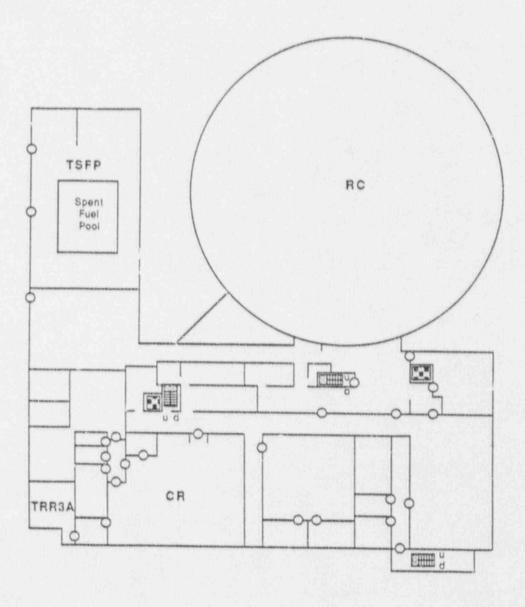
Rancho Seco Containment and Auxiliary Buildings, Elevation 40 ft.
